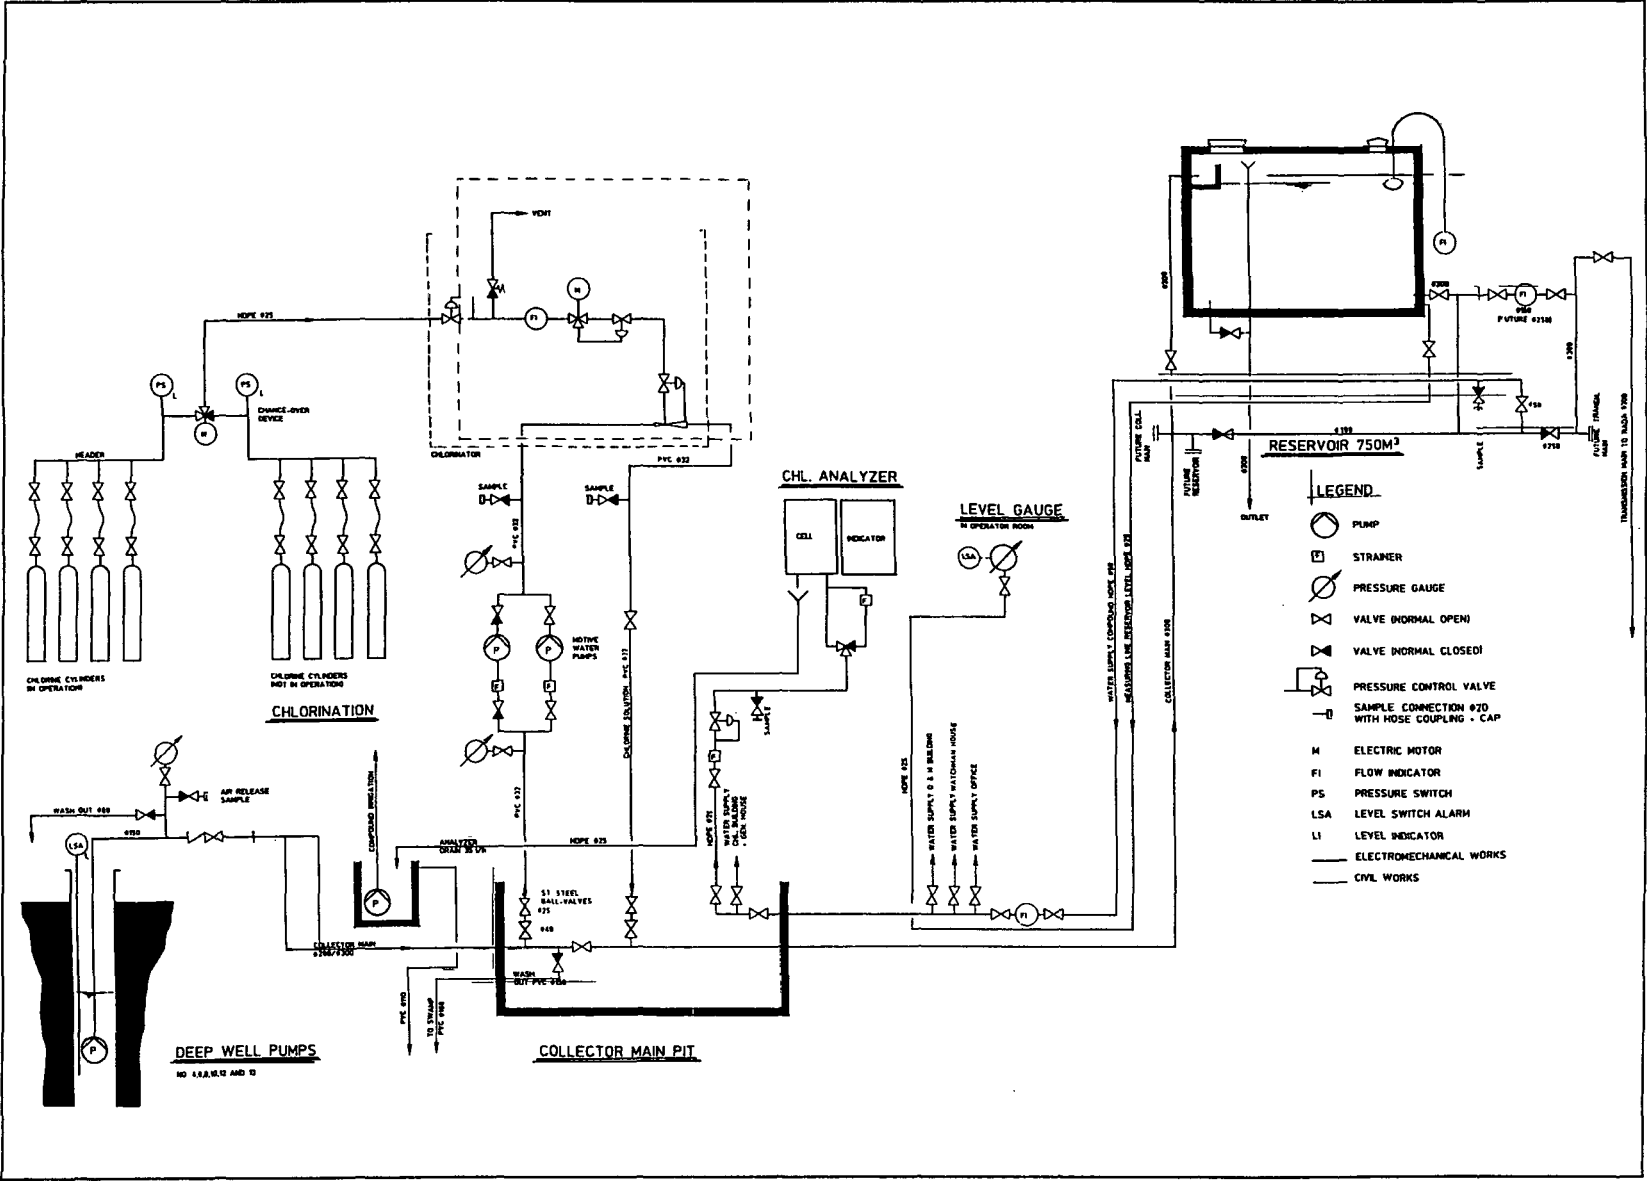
Piping and instrumentation diagram of Rada water supply system
